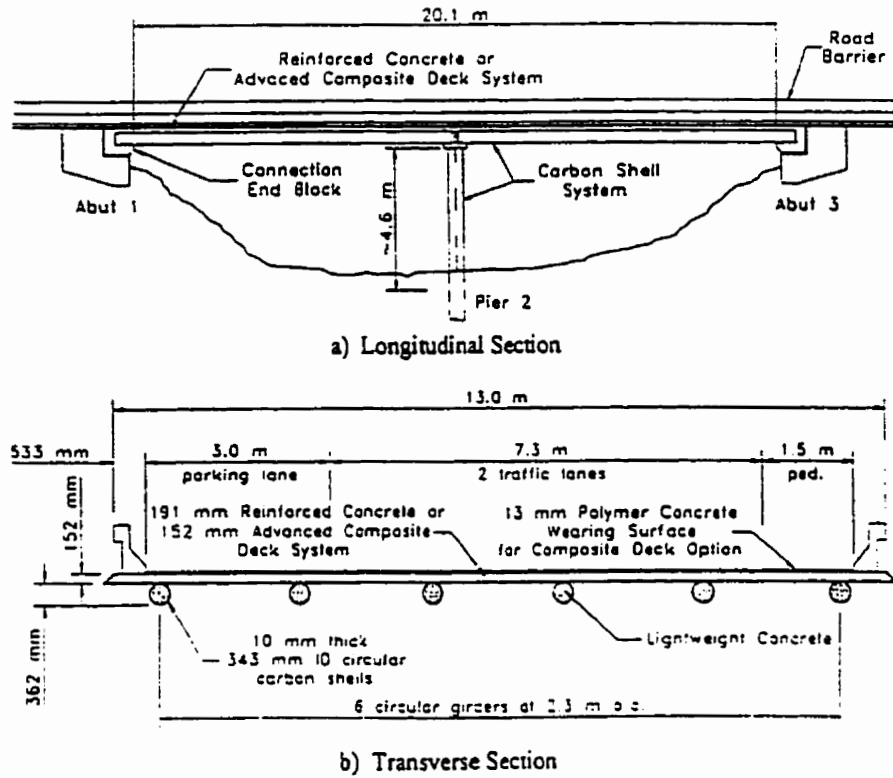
Carbon shell girder-type bridge system [Seible et al 1997]
